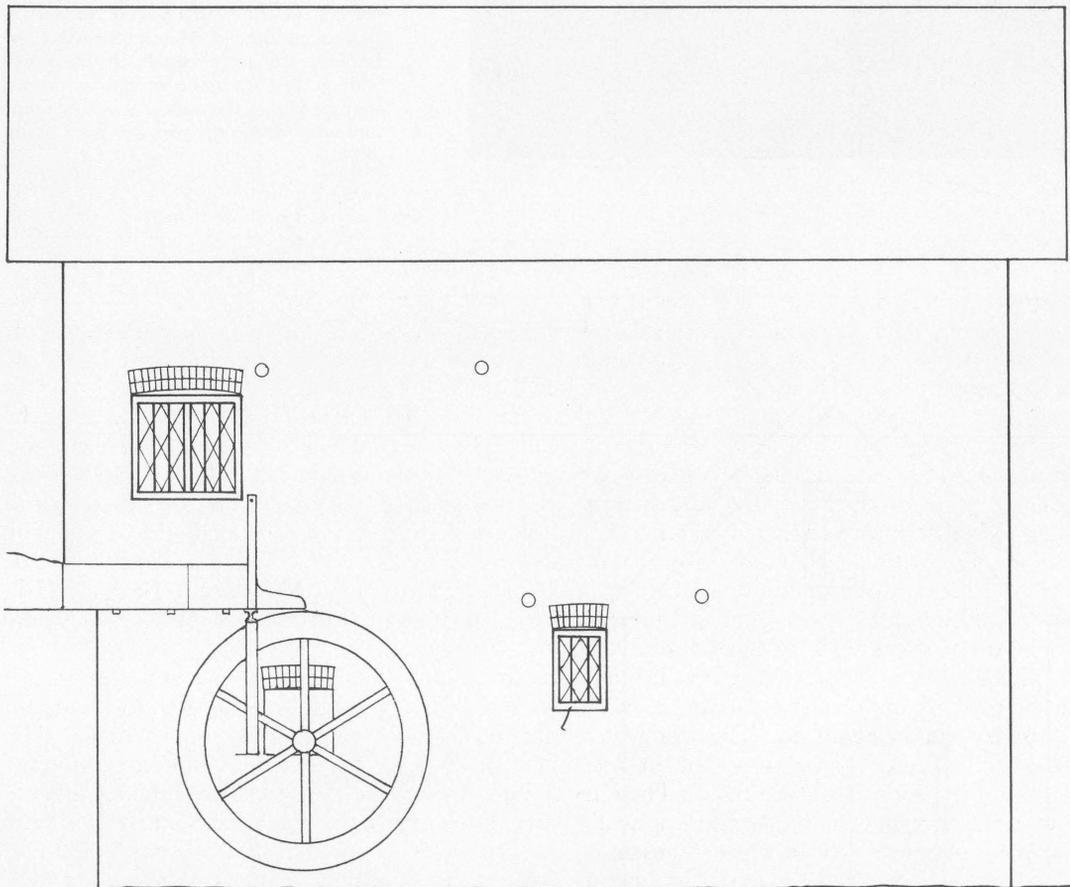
Paddington Mill: north elevation with the pentrough and waterwheel
